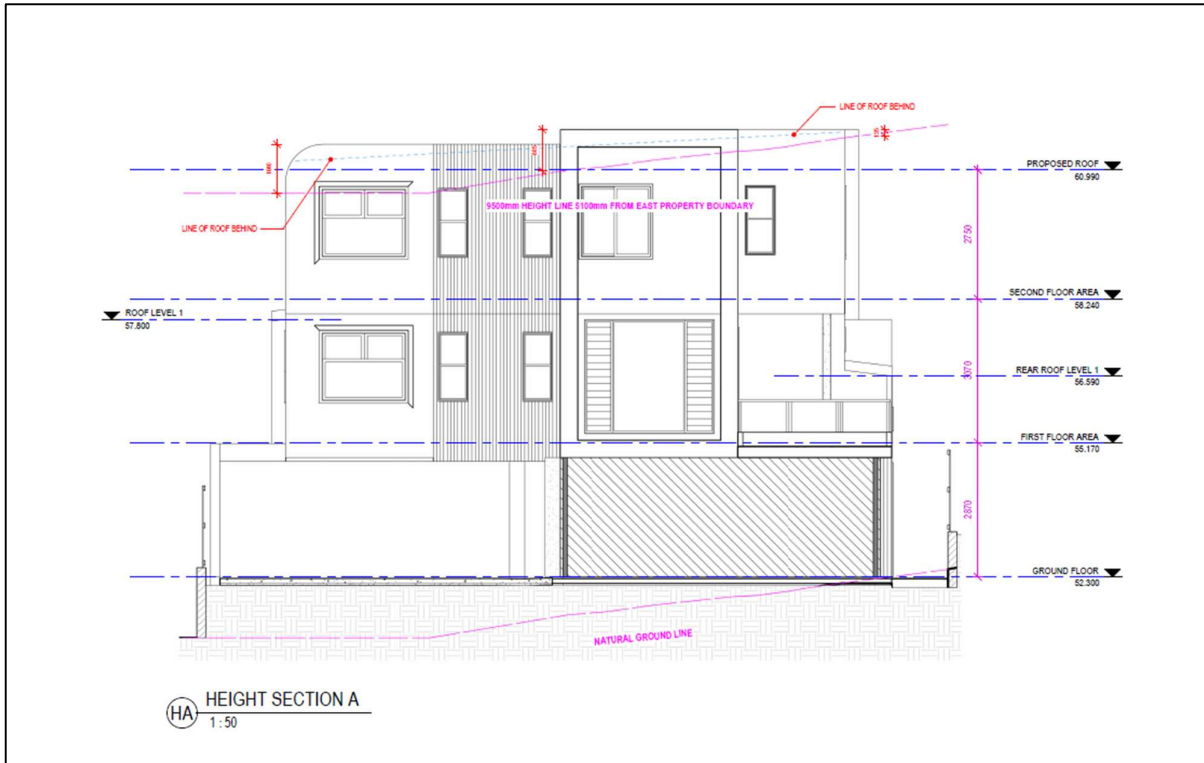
Building Height Section (Tarun Jangra Building Designers,2026)
